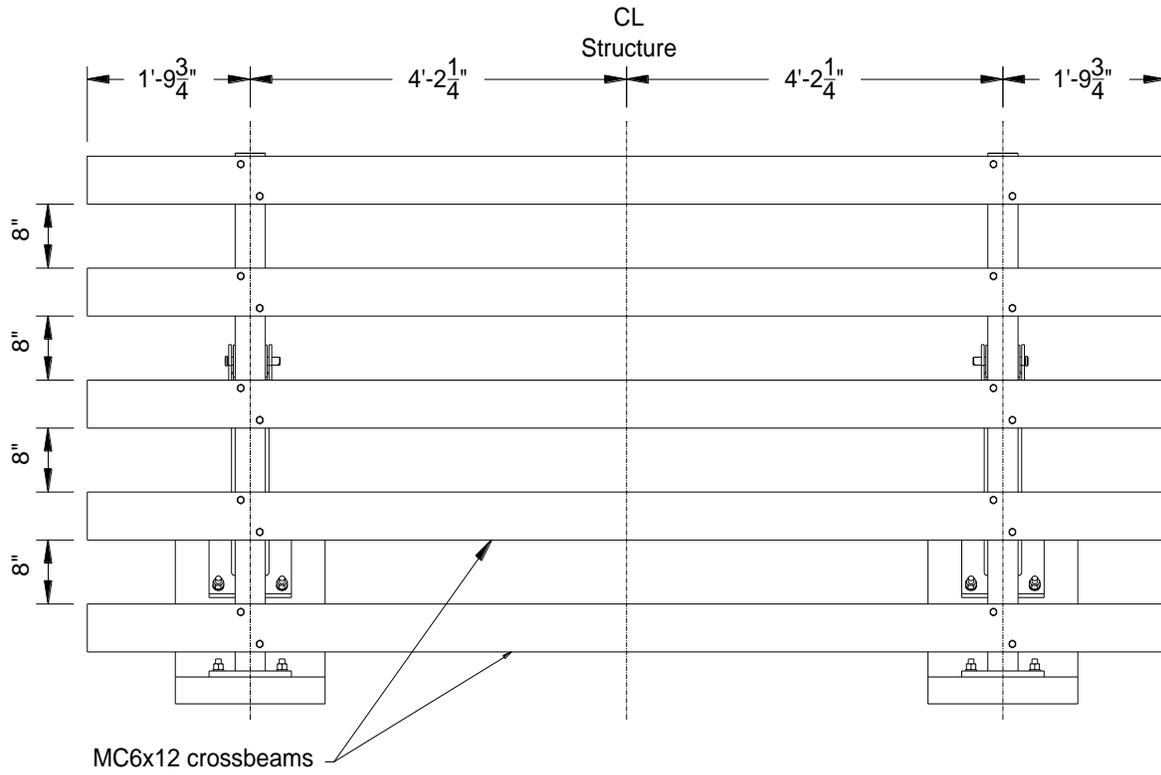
Snow supporting structure viewed downhill and normal to grate for the case of CIP concrete footings.
